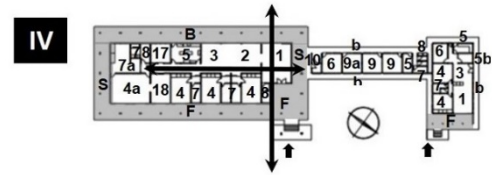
Wisma Yaso's fourth plan (1963-1964)⁴⁾
